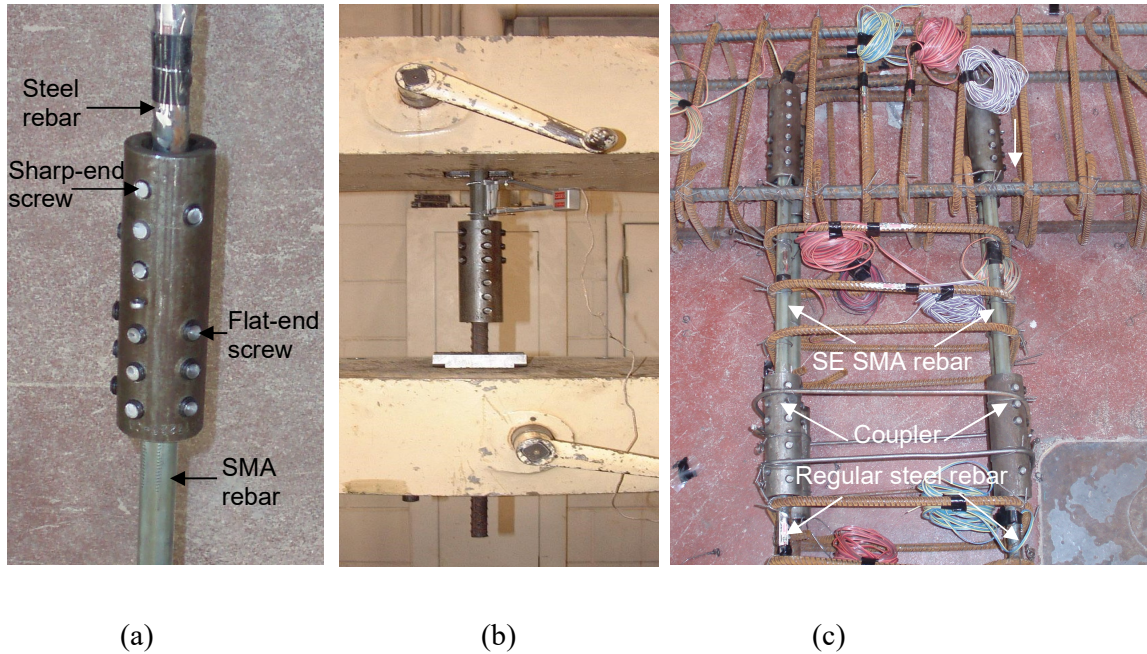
(a) Coupler used in BCJ specimens; (b) test setup of coupler in universal testing machine; and (c) reinforcement caging of BCJs.
